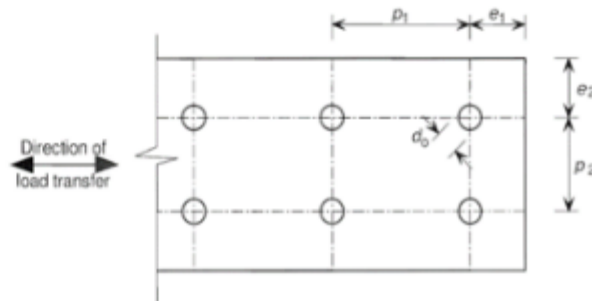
End distance, edge distance and spacings for fasteners and spot welds
